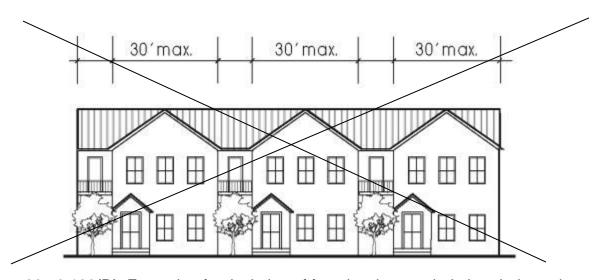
(D): Example of articulation of facades that can help break down the scale of large buildings.
